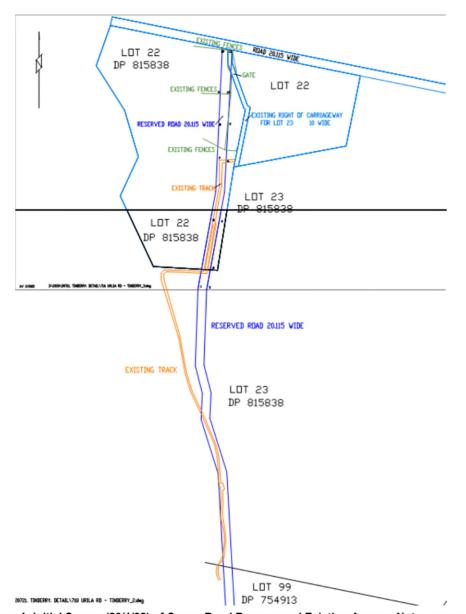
Initial Survey (29/1/22) of Crown Road Reserve and Existing Access. Note: access to Lot 23 dwelling not shown
